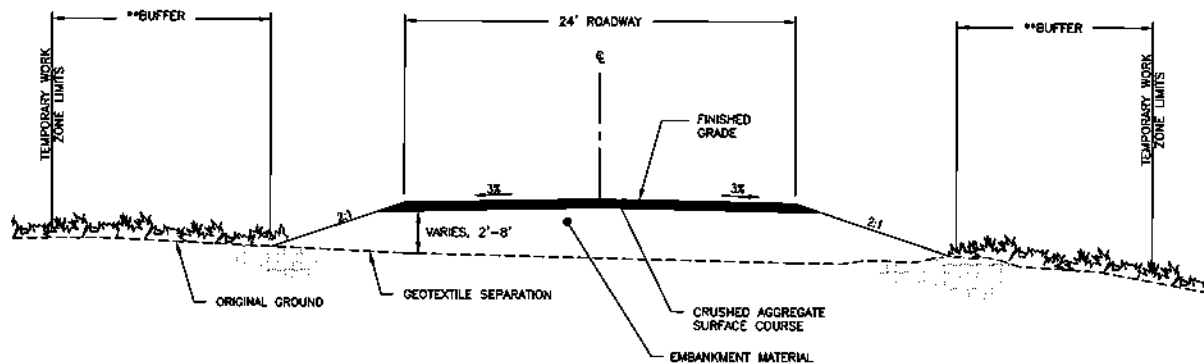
Typical Permanent Material Source Spur Road Cross Section
